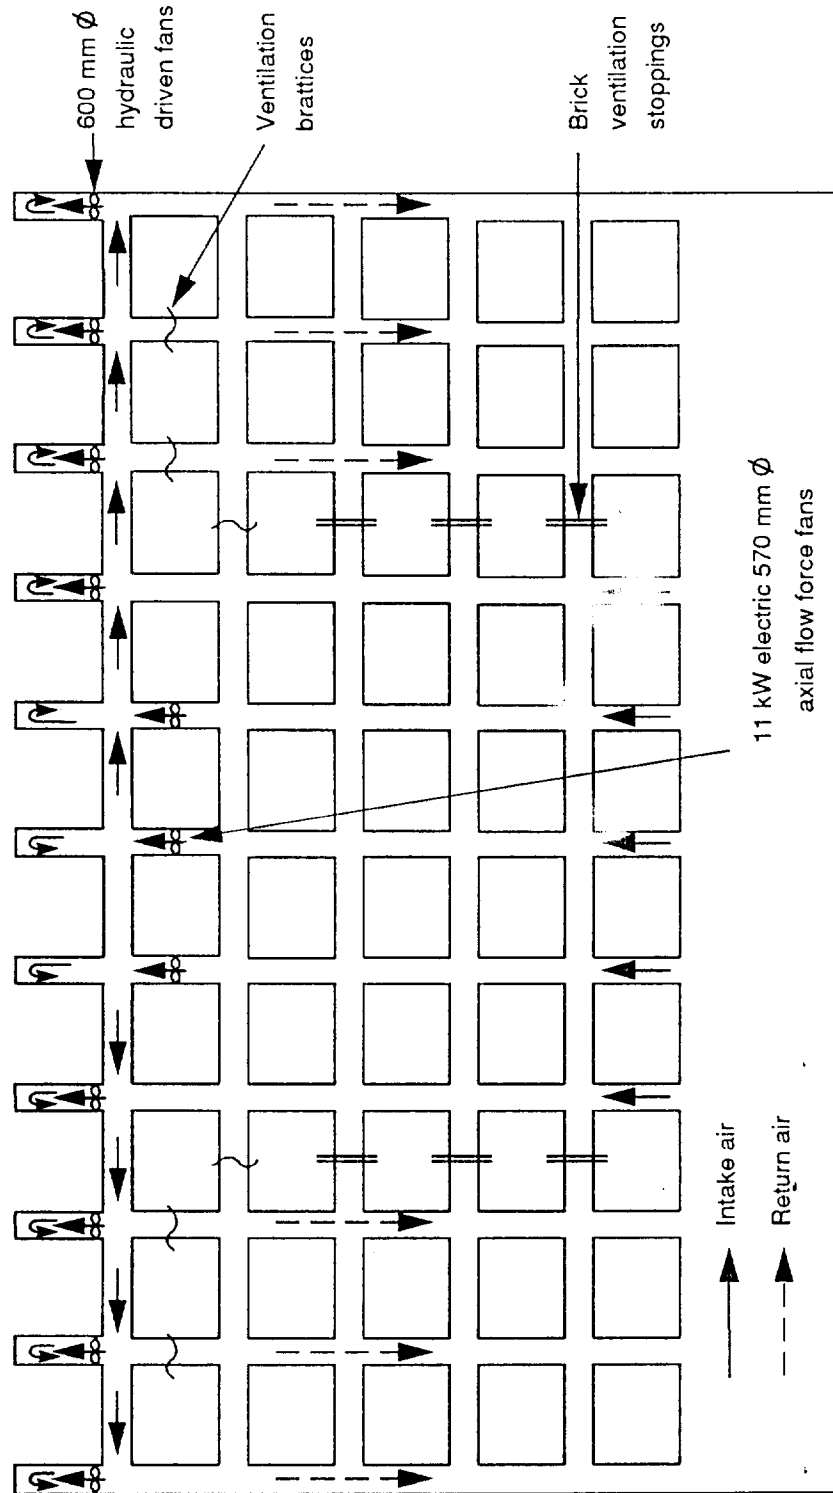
Ventilation of bord and pillar headings using auxiliary fans without ducting.
